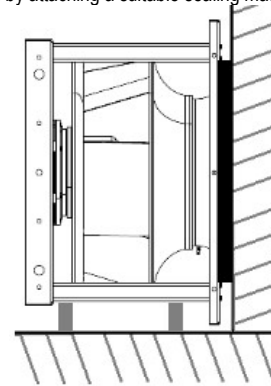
Modular EC Plenum Fan with isolation view of the intake side with sealing material
